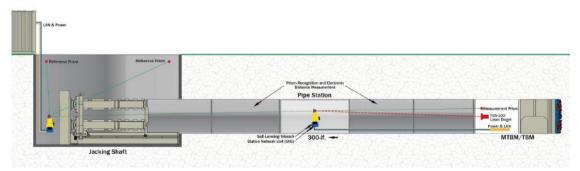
Installing first intermediate pipe station. Akkerman AZ-100 TGS
